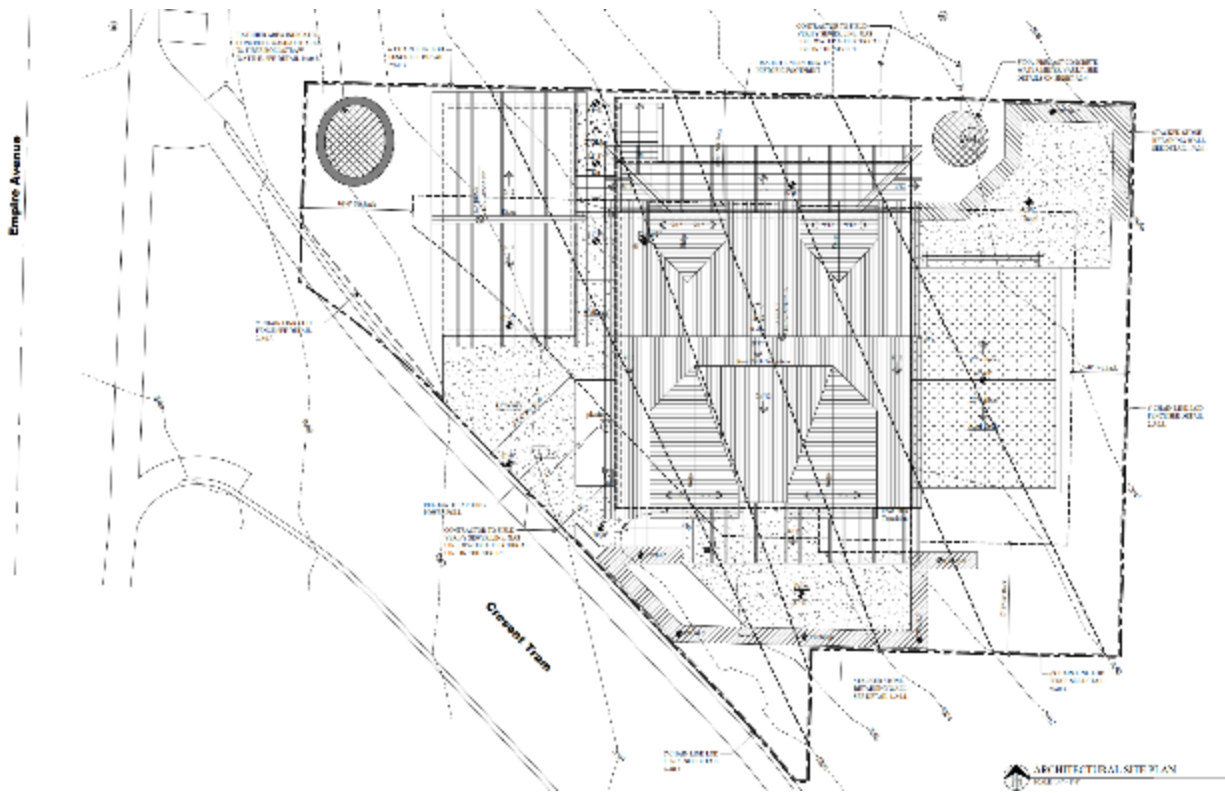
Applicant's site plan showing the addition to the east and the detached Accessory Building within the Front Setbacks to the west.
